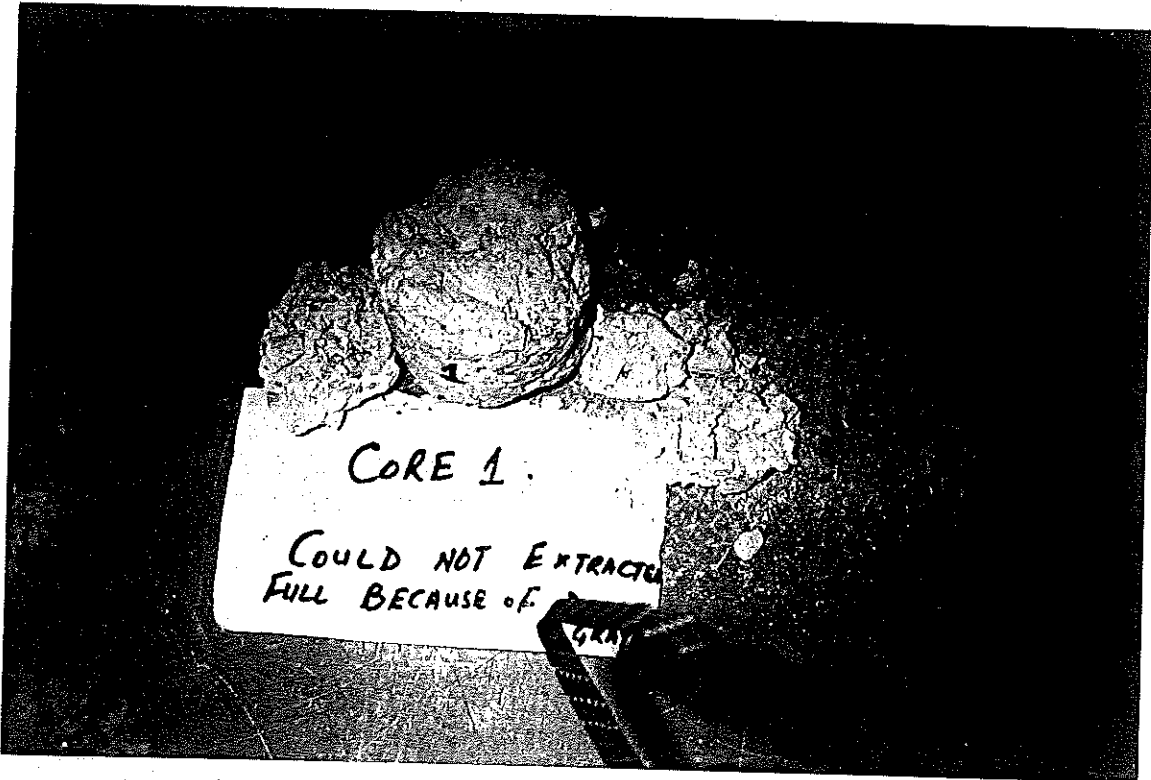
(b): Concrete core # 1 kept in the laboratory for analysis.
